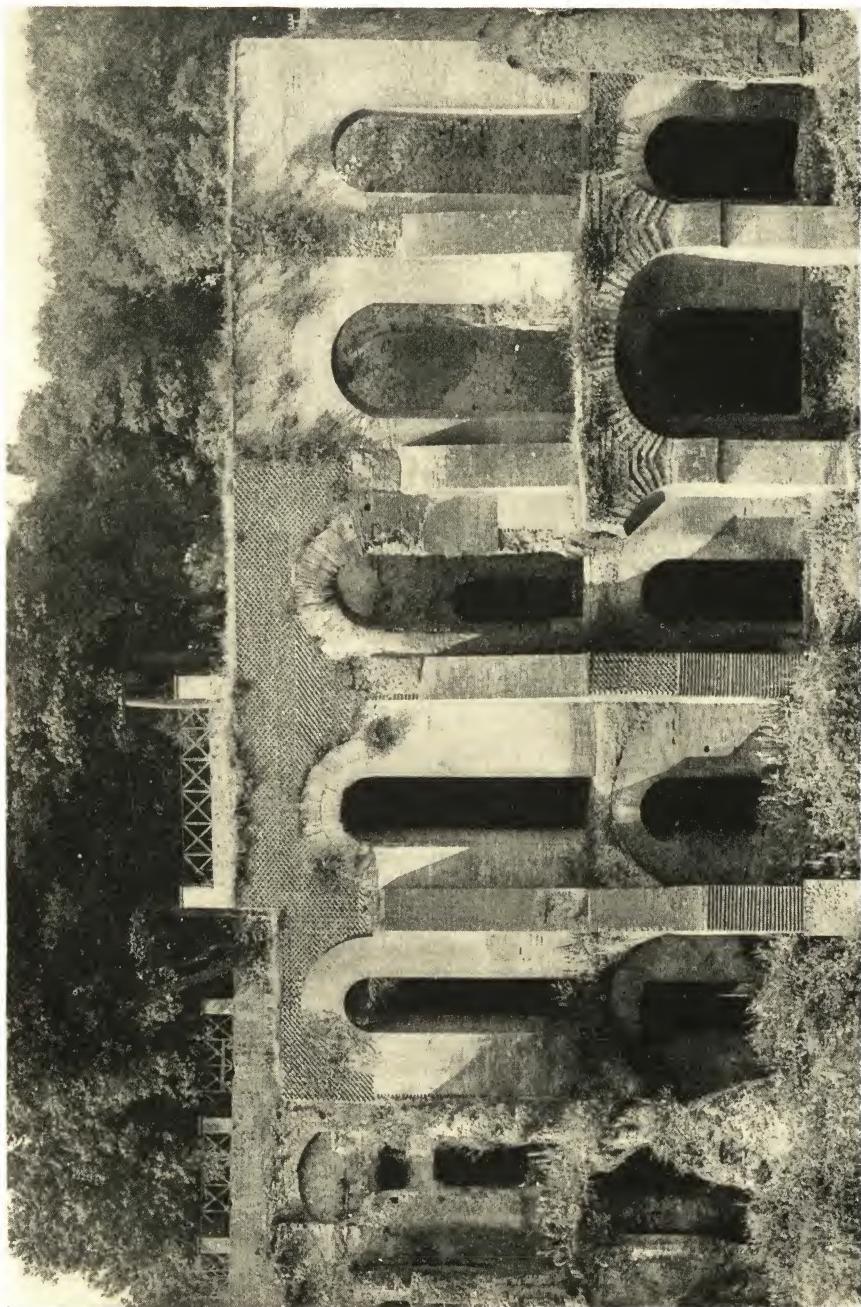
Retaining Wall and Arches of Palatine, on Forum side, Rome.
